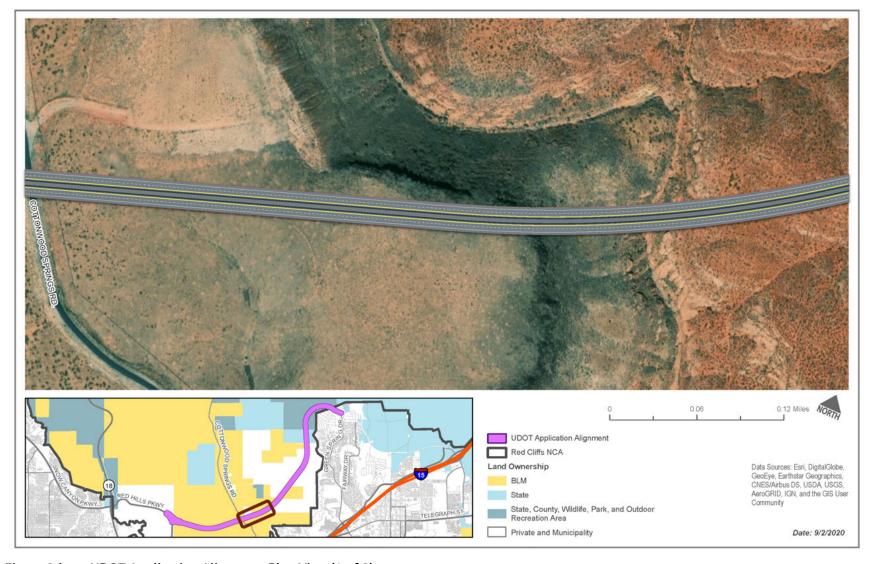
UDOT Application Alignment Plan View (4 of 9)
